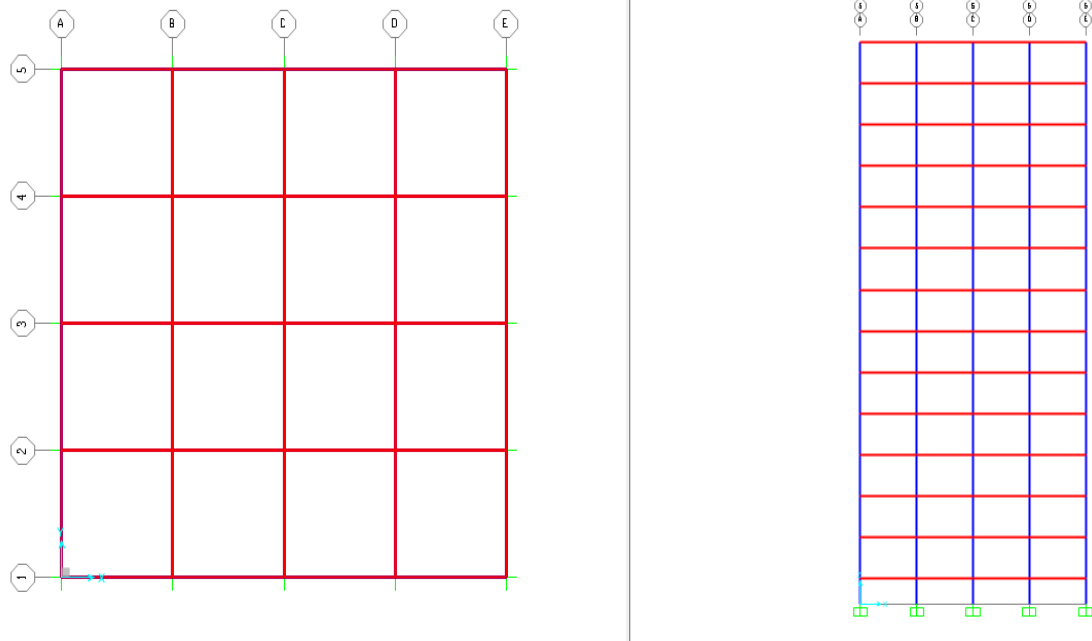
Plan and Elevation of G+12 RC multistoried framed Building in SAP2000
